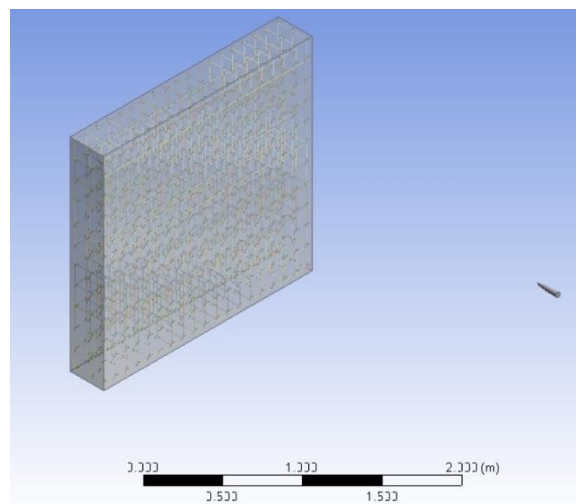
Reinforced Concrete Wall with Fragment due to 33.61 kg TNT Shaped Charge.
